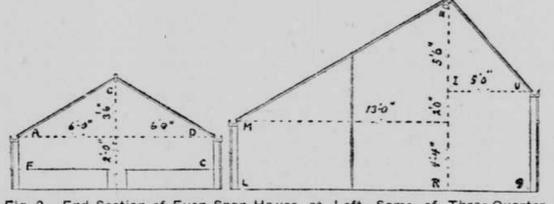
End Section of Even Span House at Left, Same of Three-Quarter Span House at Right.
